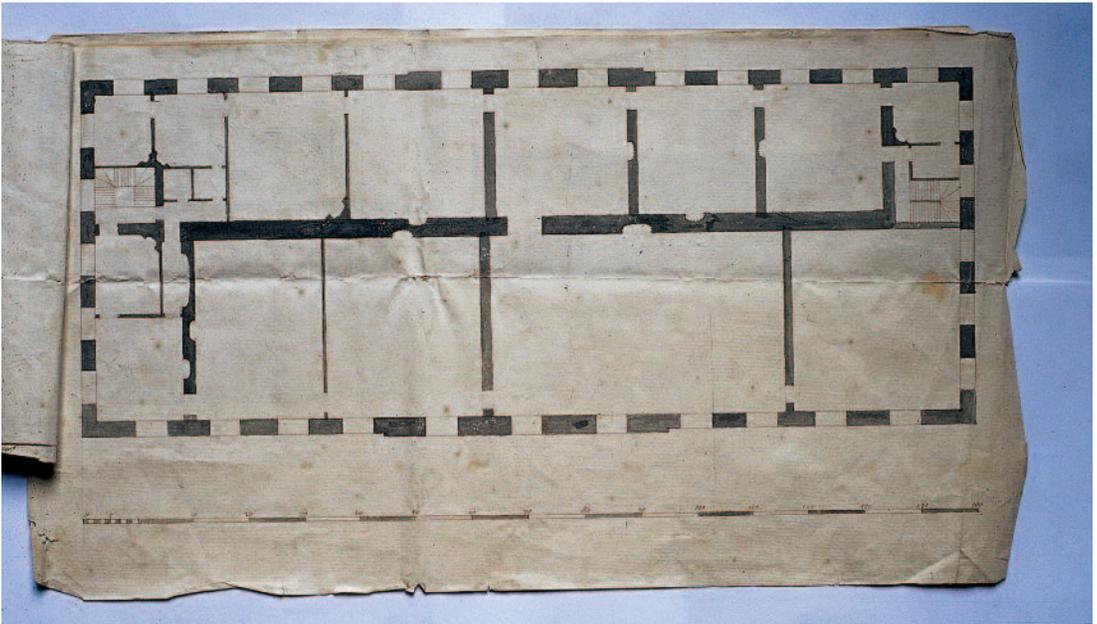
Kiveton Park, first floor plan, contract drawing by Daniel Brand, 1698.
